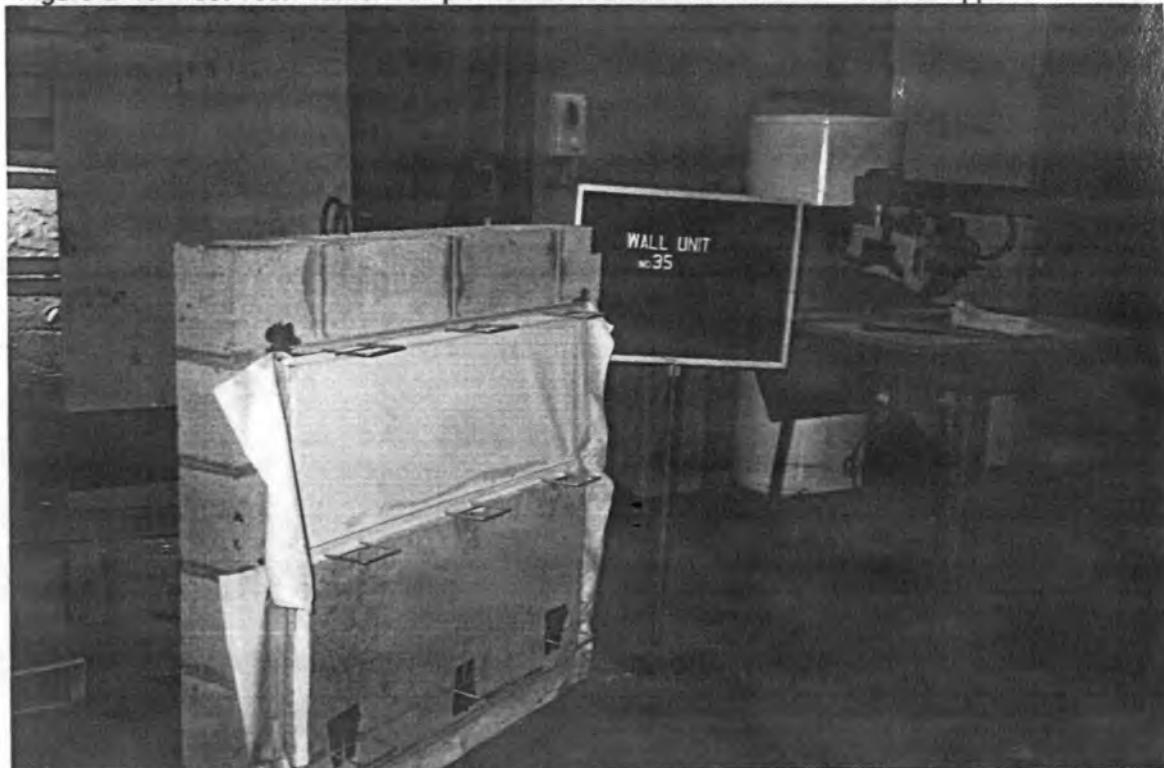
Post Test View of Sample Number 13 on Brick-Tie Wall - Mechanical Applied Air Barrier
